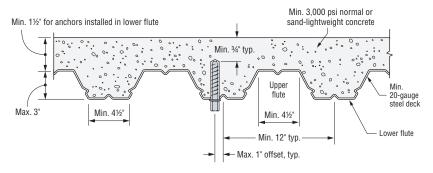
THD50234RH Installation in Concrete over Steel Deck
